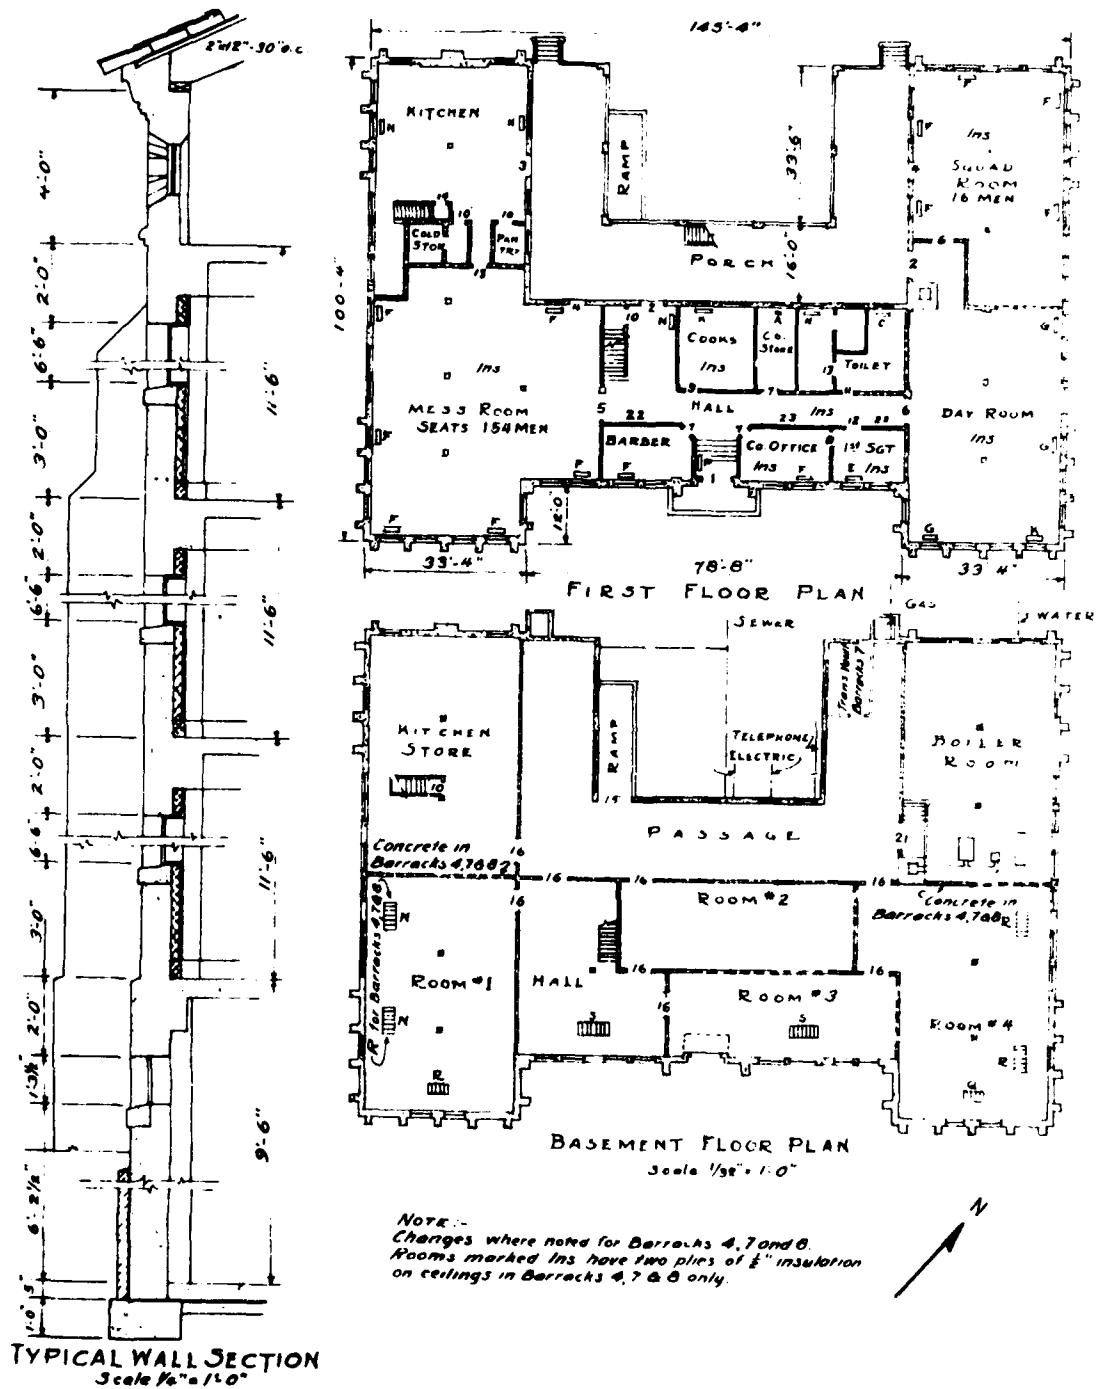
HAMILTON AFB BUILDING 424 FLOOR PLANS
